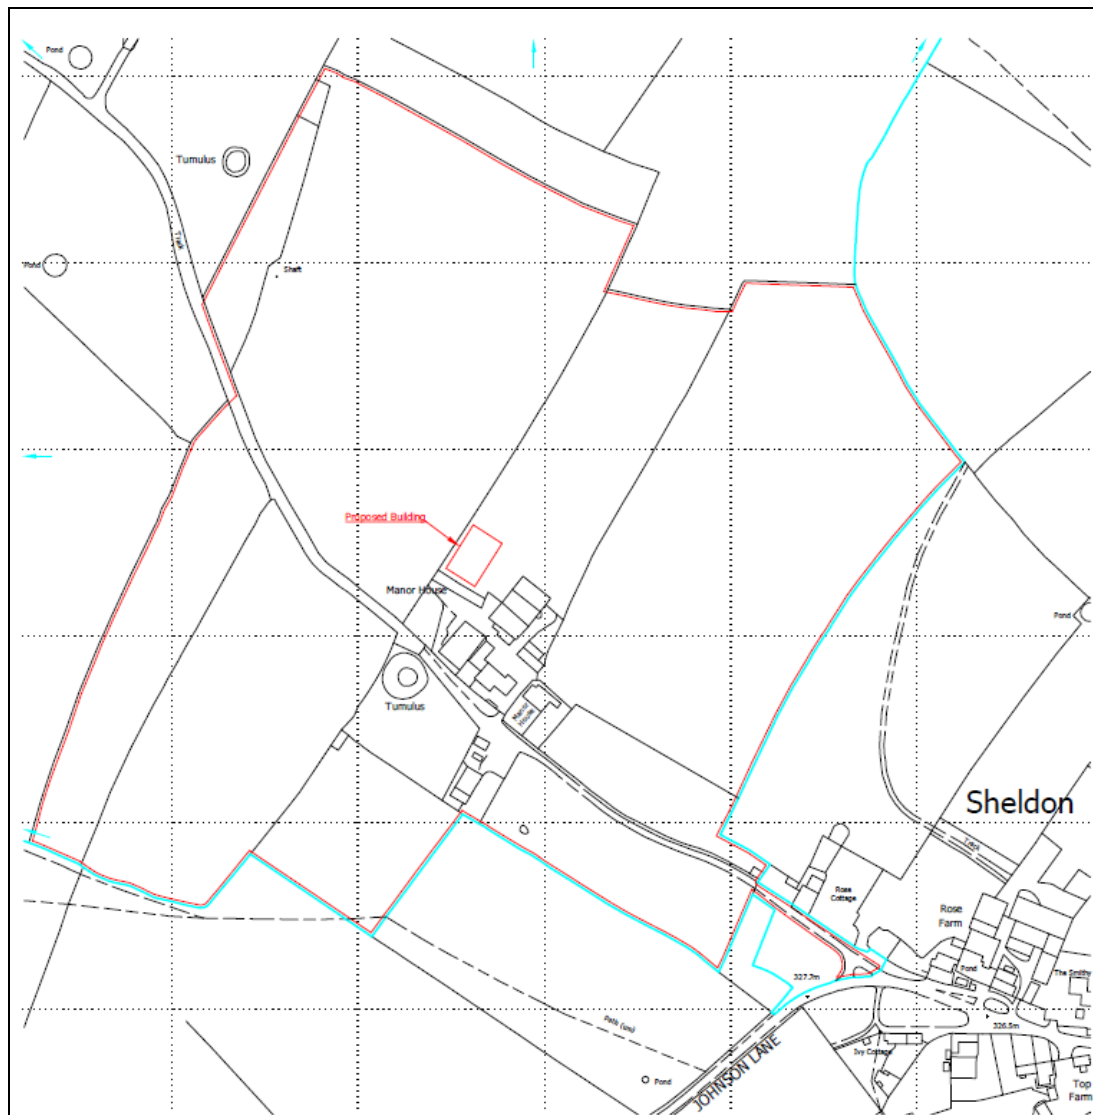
Detailed location of site (from planning application NP/DDD/1213/1071)
